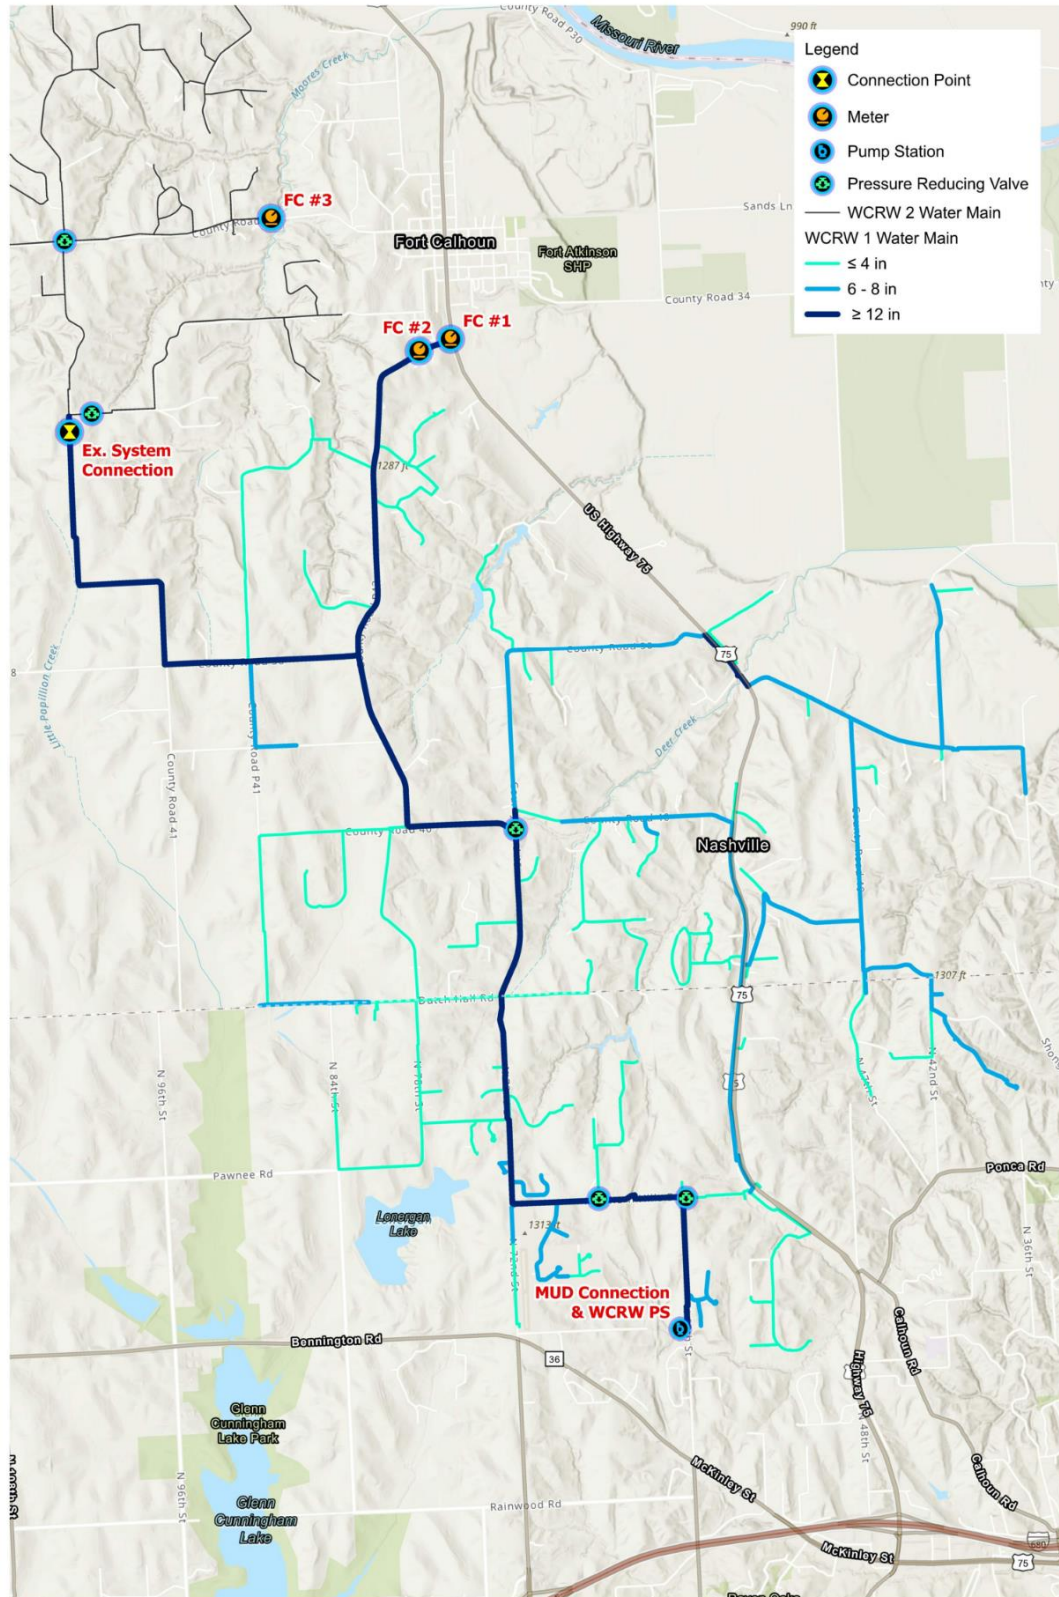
WCRWS NO. 1 EXISTING LAYOUT
